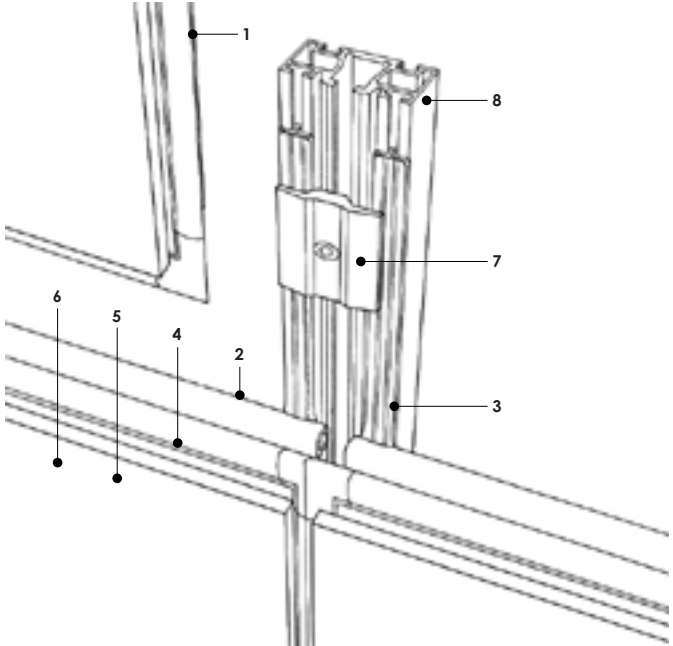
Panel assembly drawing of Aspect 2, designed by Michael Stacey
